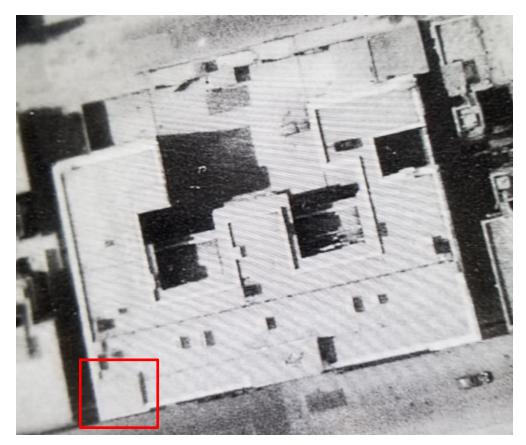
Pitched roof at north east corner in 1949 aerial photo [Lands Department modified by author]
